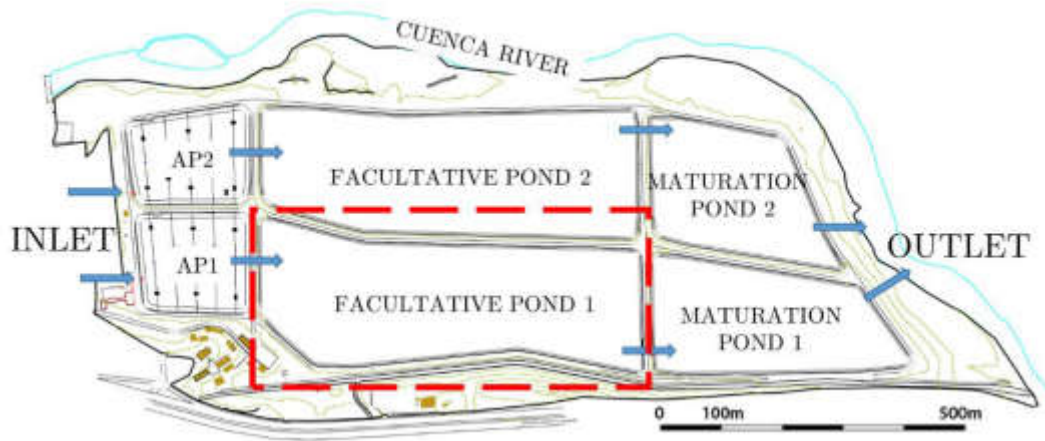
The typical WSP layout indicating the parallel configuration, extract from Ho *et al.* (2018).
